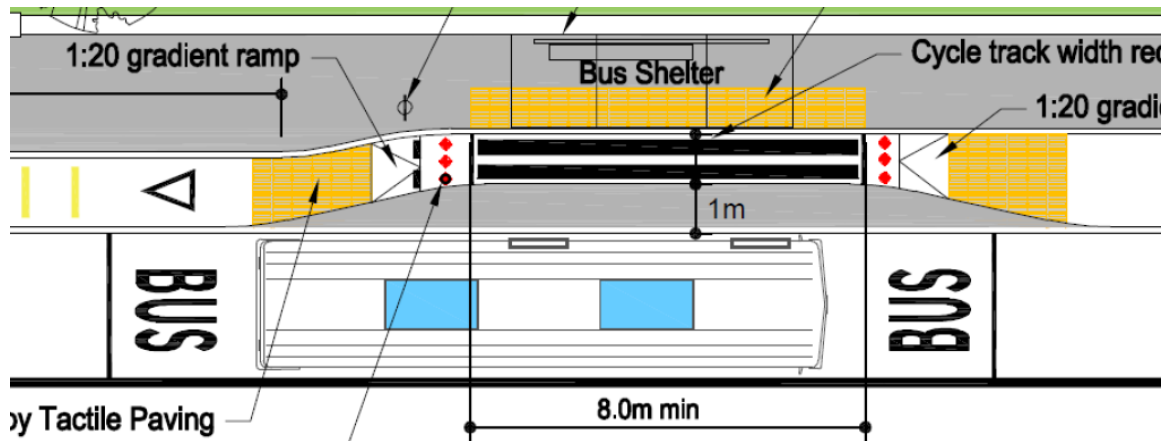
Alternative Shelter Location Back of Footpath (Narrow Island with Adequate Footpath Widths)
